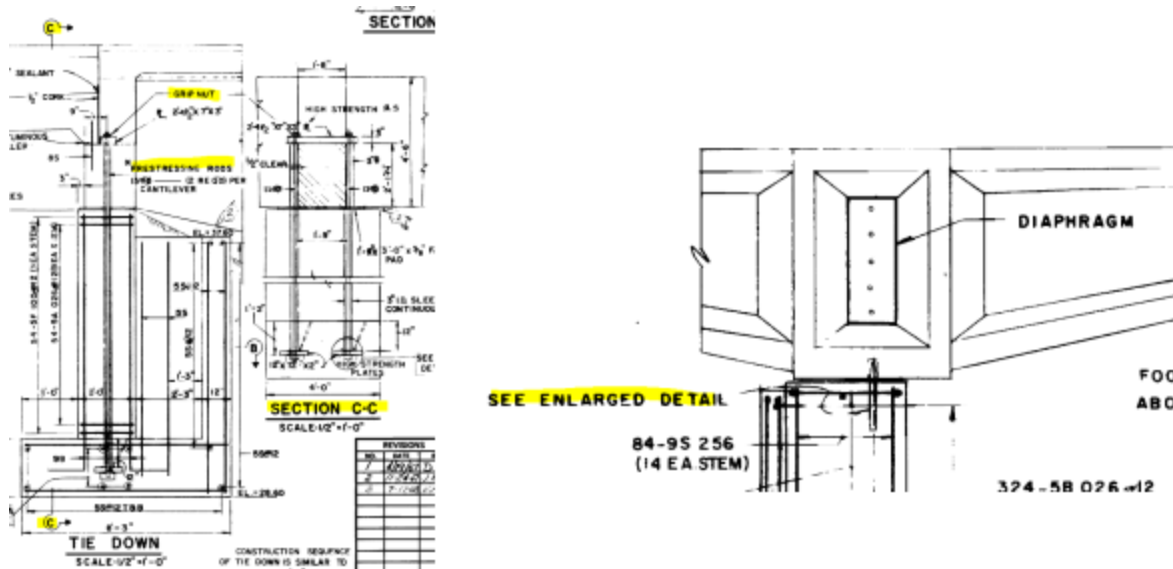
Details of Tie-Down and Abutment Stem Support @ PT Beam 1
